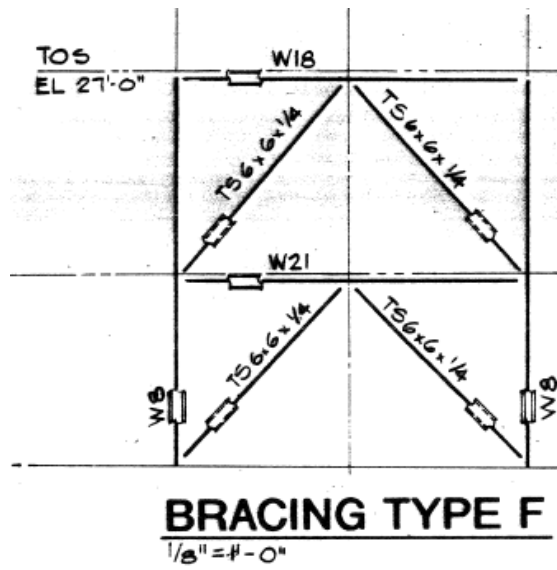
Frame Elevation (92WA2A--ZZ-79-2)
